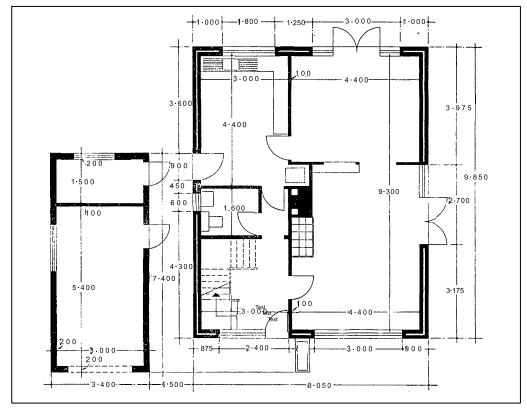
Example Floor plan at Location Drawings (Adler, 1969).
